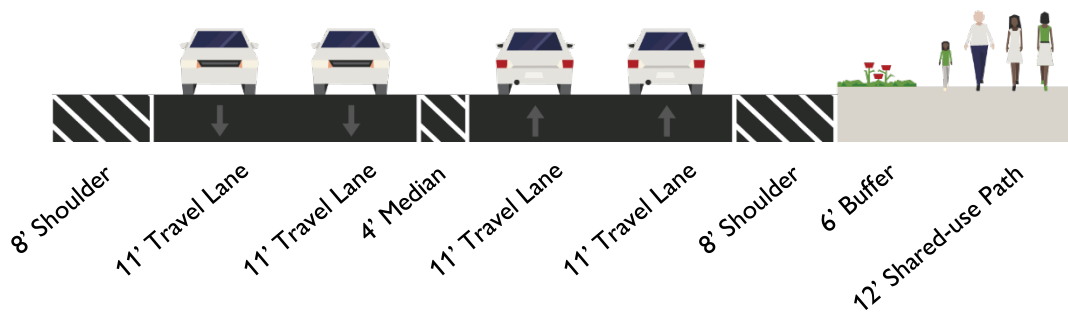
Highway 2 Typical Cross-section – E. 112th to I-76
